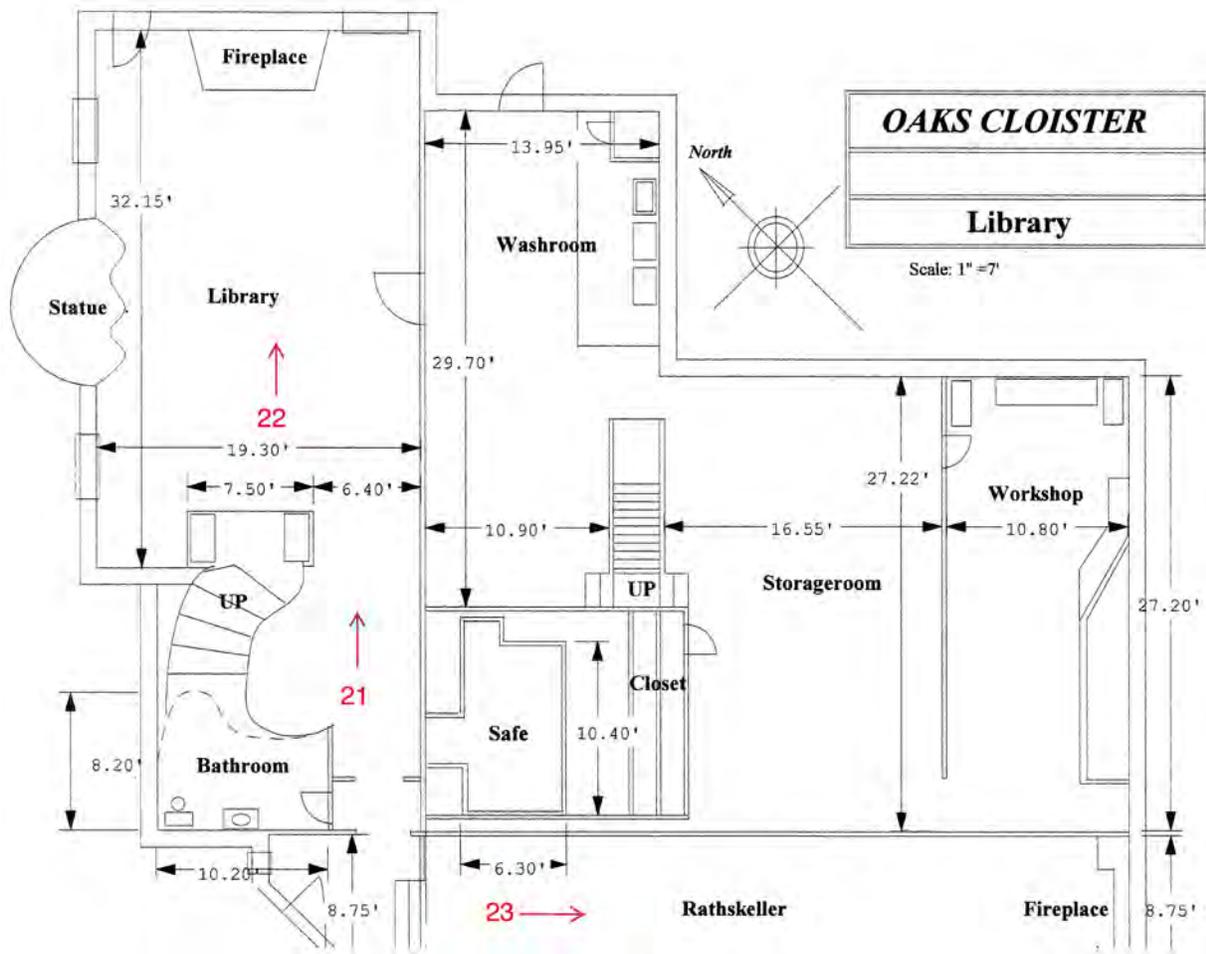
Library (in the tower section, to the left) and House, Basement level, showing photo locations.
